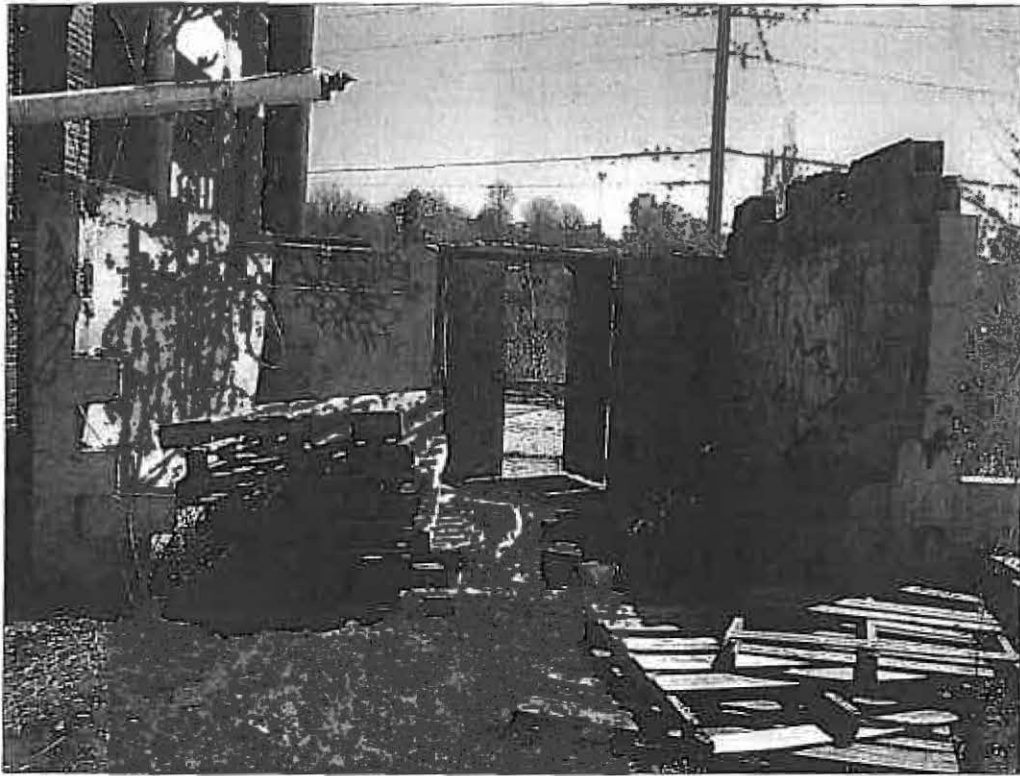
Former 1-story structure at rear of Building No. 7 (south side).
